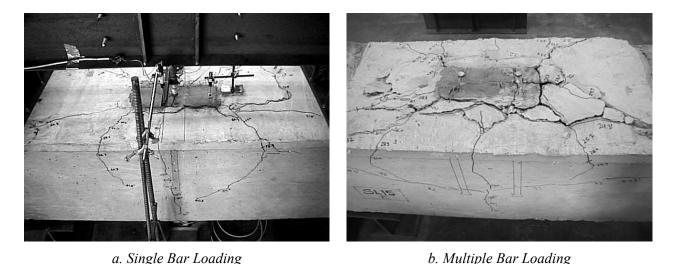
Failure Surfaces for Single Bar and Multiple Bar Loading (SL03 and SL15)
